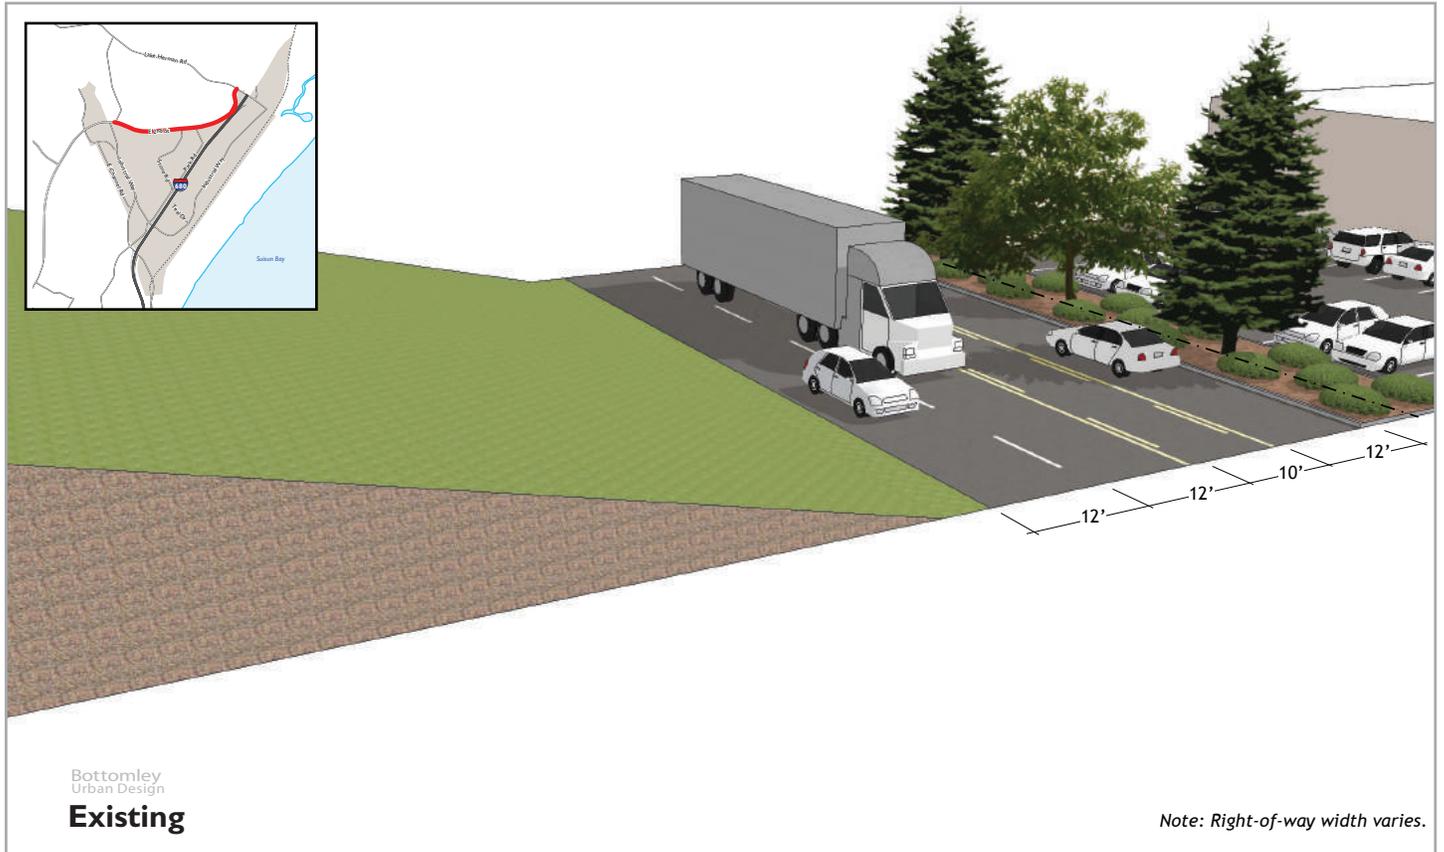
PARK ROAD (INDUSTRIAL WAY TO EAST 2ND STREET) – SHARED-USE PATH
